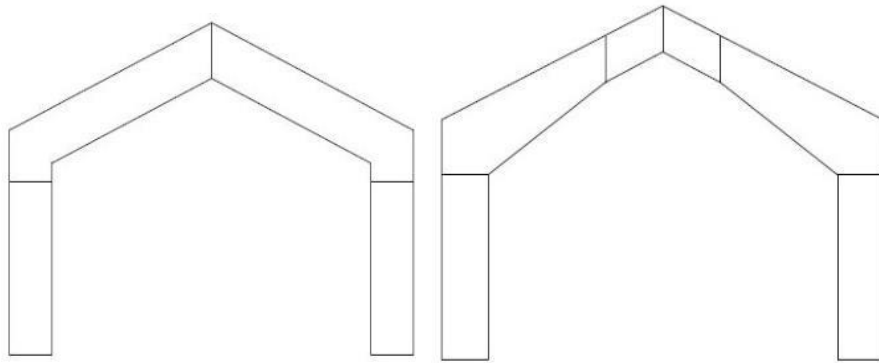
Conventional Steel building frame and Pre Engineered building frame, respectively
